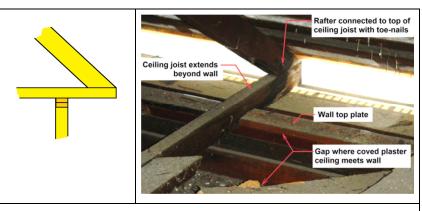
BAD: Archaic roof connection using extended ceiling joists to create soffit at eaves. The rafter connection to ceiling joist is marginal. Photo: Max Curtis, GGASHI
